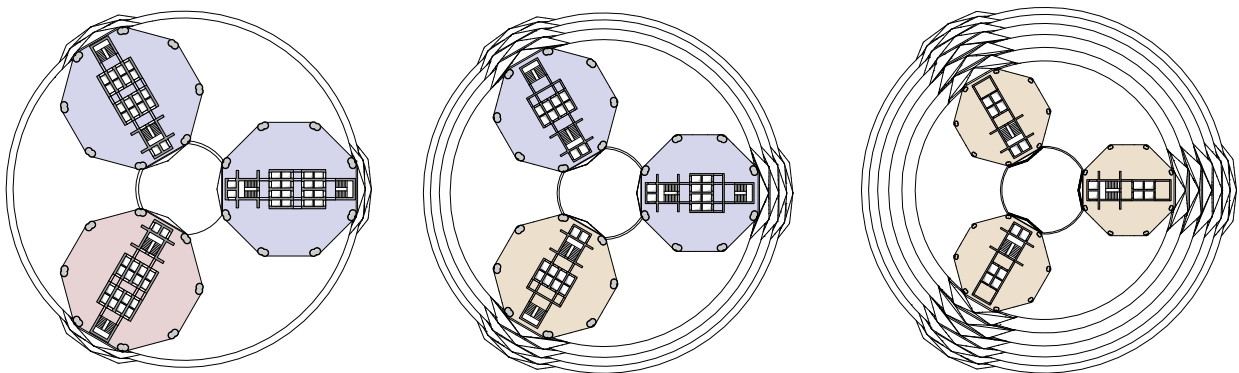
Floor plans at level 69.5 m, 157.2 m and 246.2 m (ref. colors to fig. 19)
